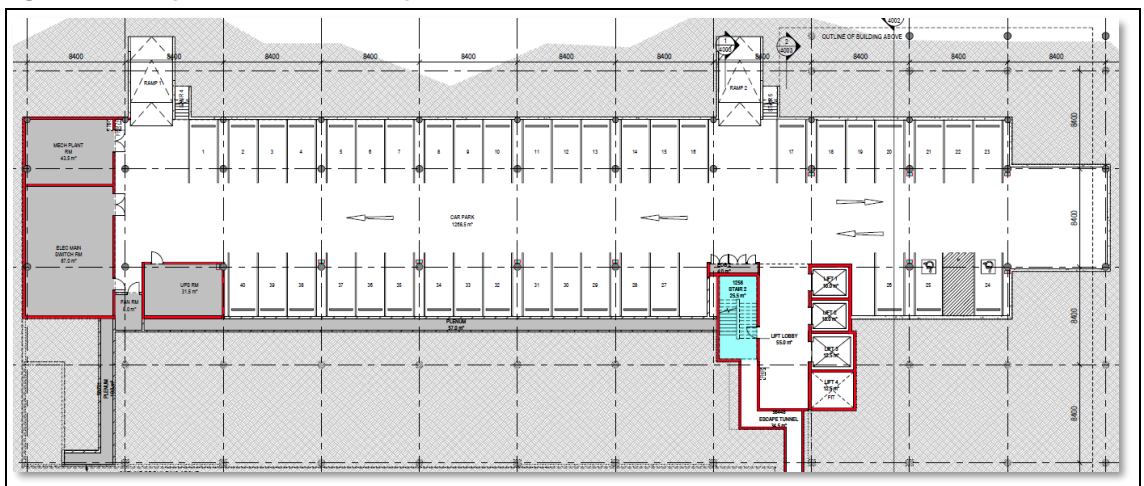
Proposed CP1 layout redesign and Stage 3 building car park accesses
